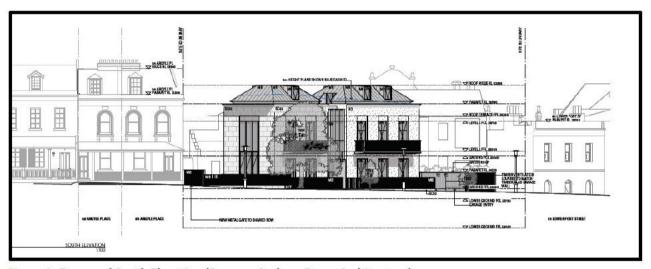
Proposed South Elevation (Source - Andrew Burns Architecture)
